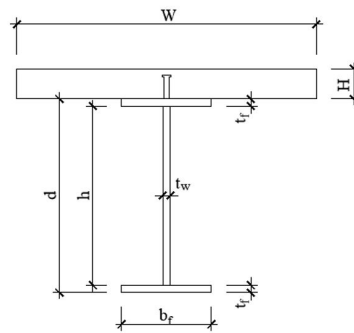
Nomenclatures of the dimensions of composite beam cross-section.
